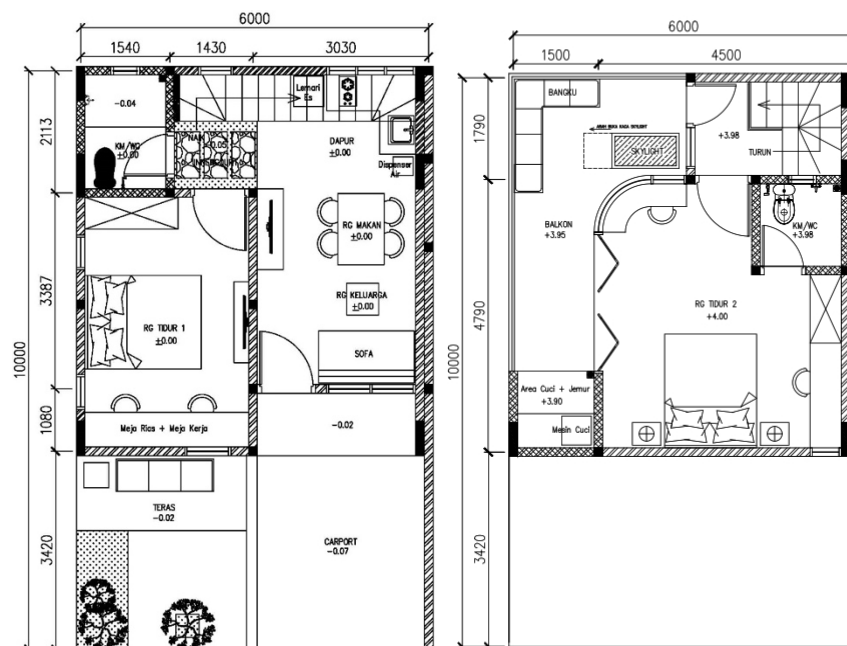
Proposed Ground- and Upper-Floor Plans (Scale to Fit)
